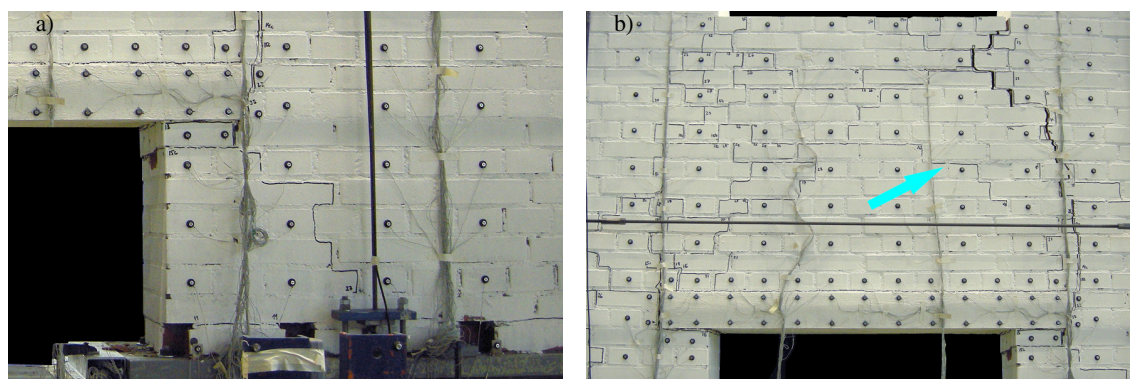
TUA: Stair-stepped cracks in the North pier at LS 28 (a) and onset of the formation of a shear crack running from the South top corner of the spandrel to the North bottom one at LS 28 (b). Drift towards North with $\theta_{nom} = 0.6\%$.
